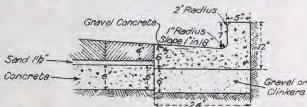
STANDARD CONCRETE KERB & GUTTER
